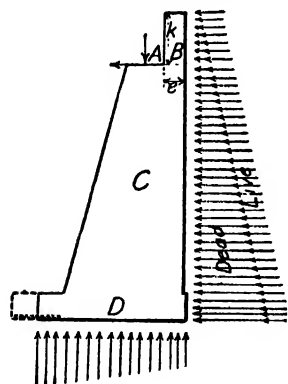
a*.—Section of Abutment Indicating the External Forces Acting upon It.
